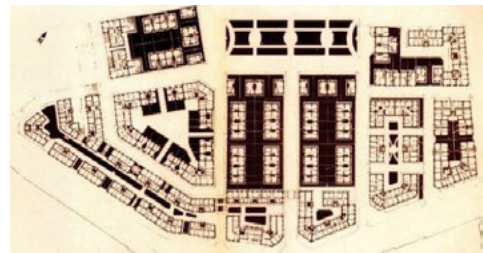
Ground Floor Plan of the district San Saba in Rome.
